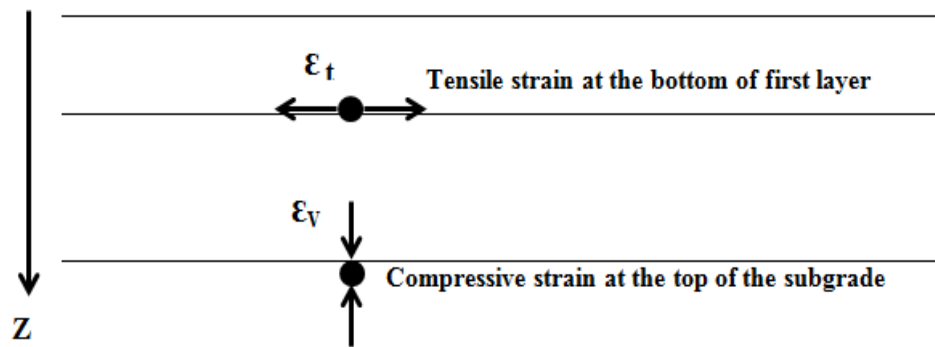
Failure modes and Critical strains for flexible pavement
